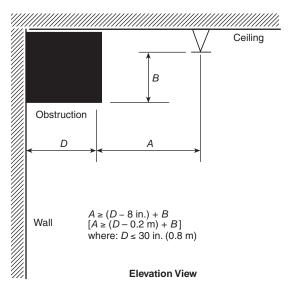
(b) Positioning of Sprinkler to Avoid Obstruction Against Walls (Residential Upright and Pendent Spray Sprinklers).
